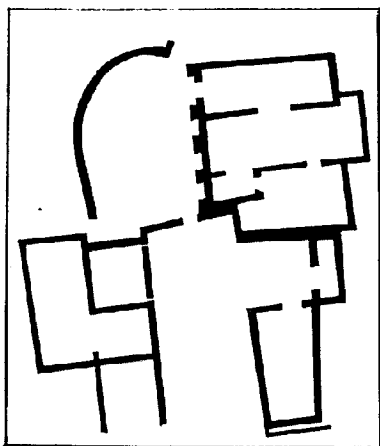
Plan of Houses at Tell Rashid. (after Jasim 1983).
